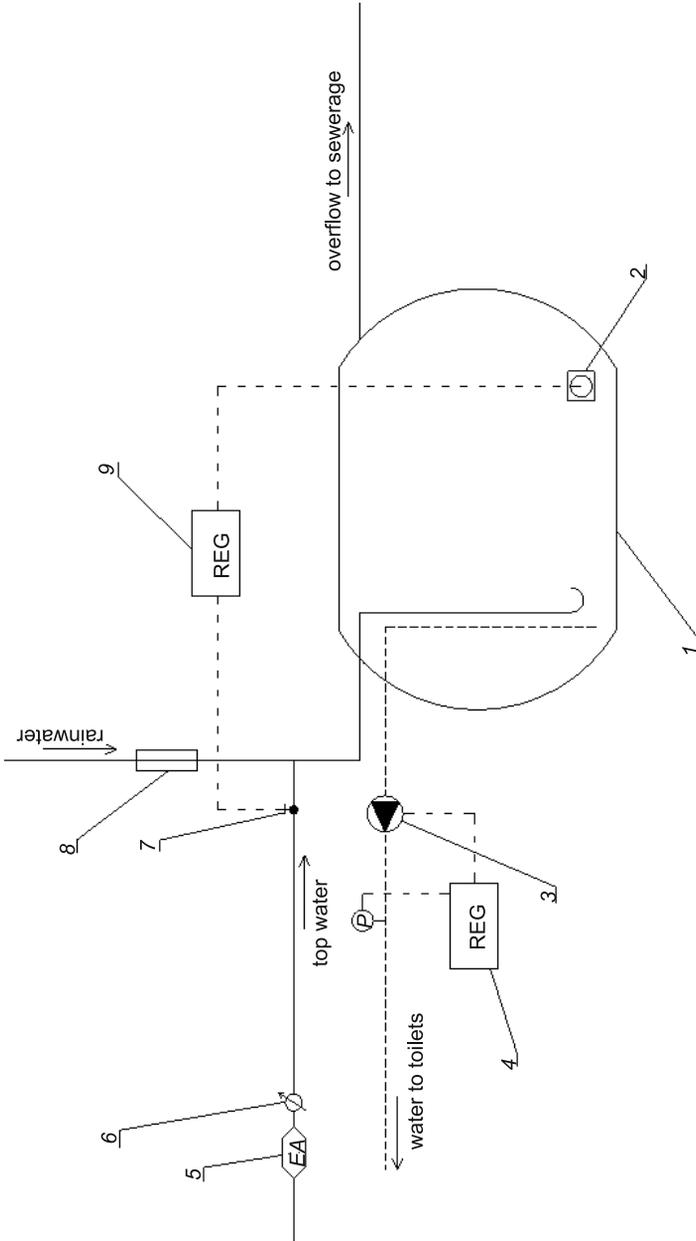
Rainwater harvesting system example installation scheme: 1 – rainwater collecting tank Blue Line II 1000 dm<sup>3</sup> PE; 2 – water level sensor; 3 – pump activated on basis of pressure sensor; 4 – controller; 5 – anti-contamination filter; 6 – water meter of tap water; 7 – valve with actuator activated on basis of rainwater level sensor; 8 – inner gutter filter; 9 – controller
